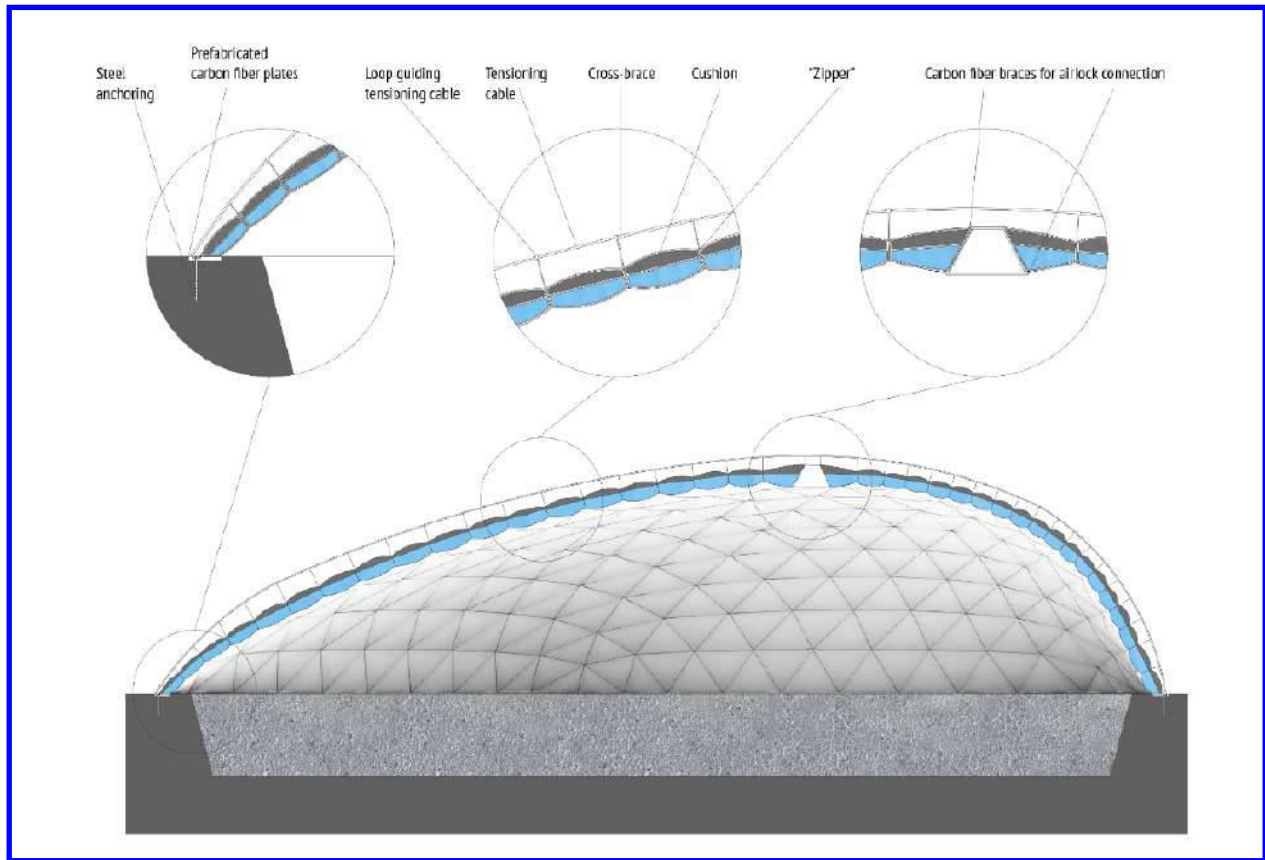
Structural cross-section of the Wrocław University inflatable, cable-restrained roof.
